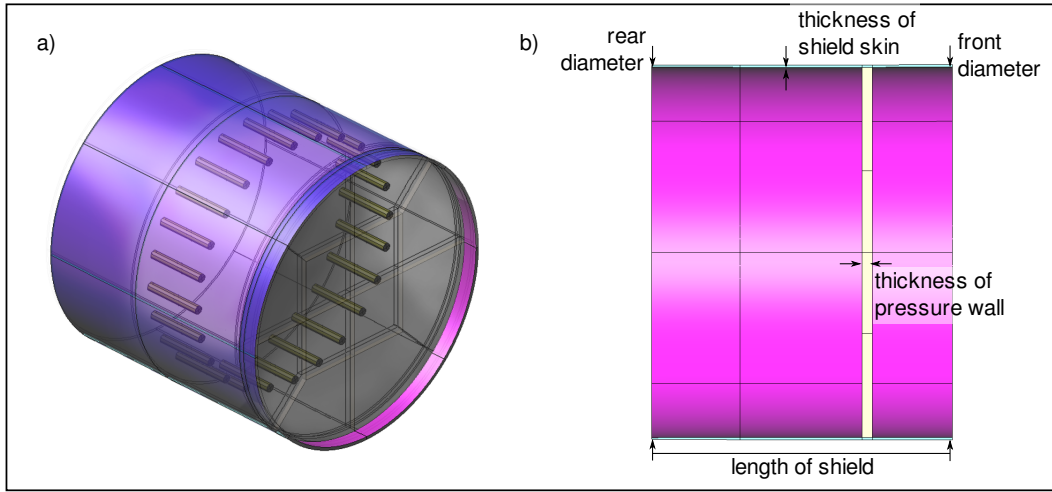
Geometrical model of the shield machine: a) transparent view of shield geometry and hydraulic jacks; b) dimensions of the shield
